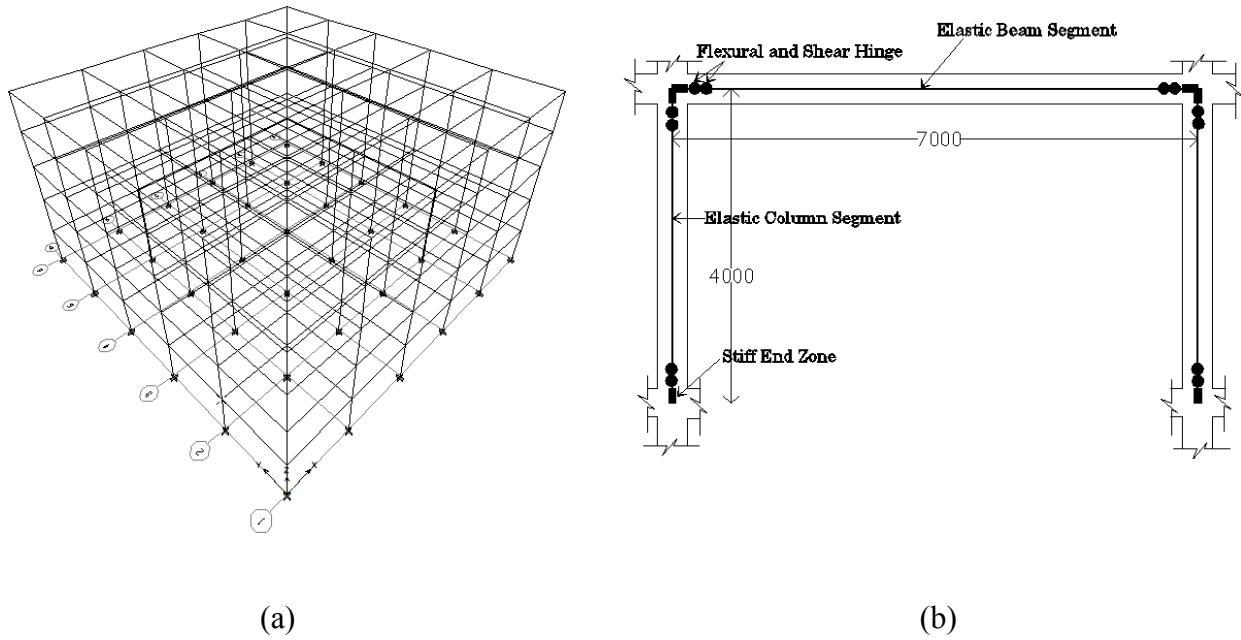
Schematic diagram of (a) 5-storey building modeled in ETABS and (b) concrete frame element in analytical model developed with PERFORM-3D and
